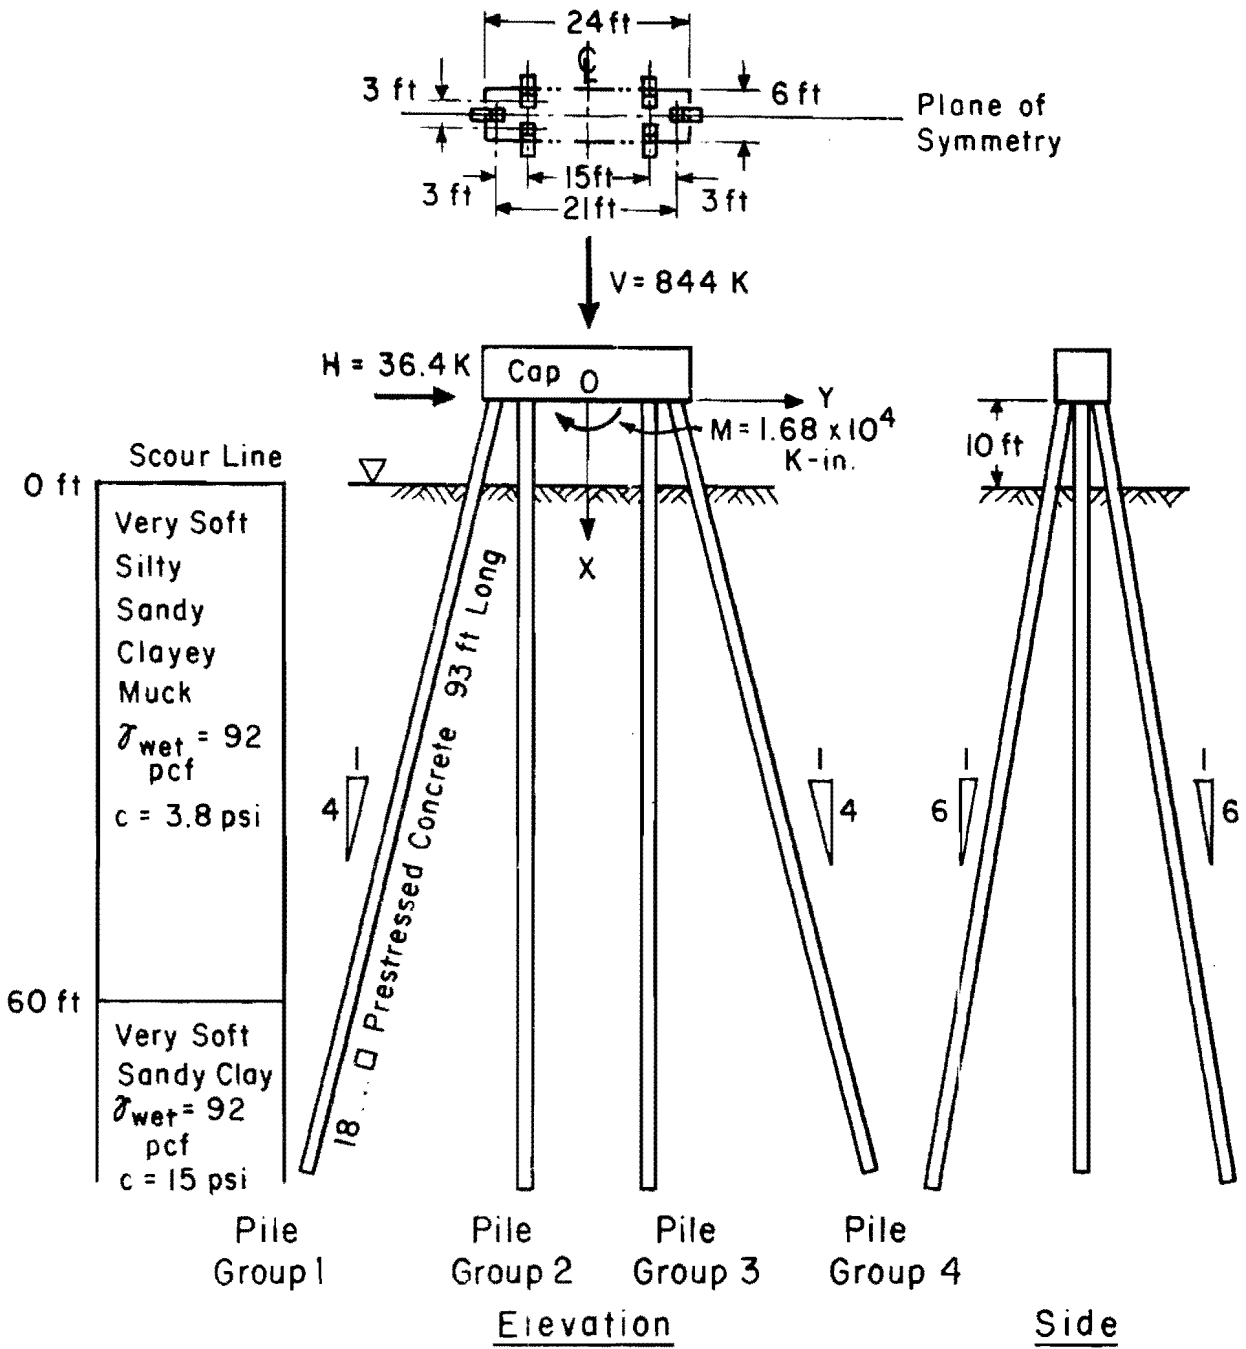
Copano Bay Causeway Bridge Foundation
